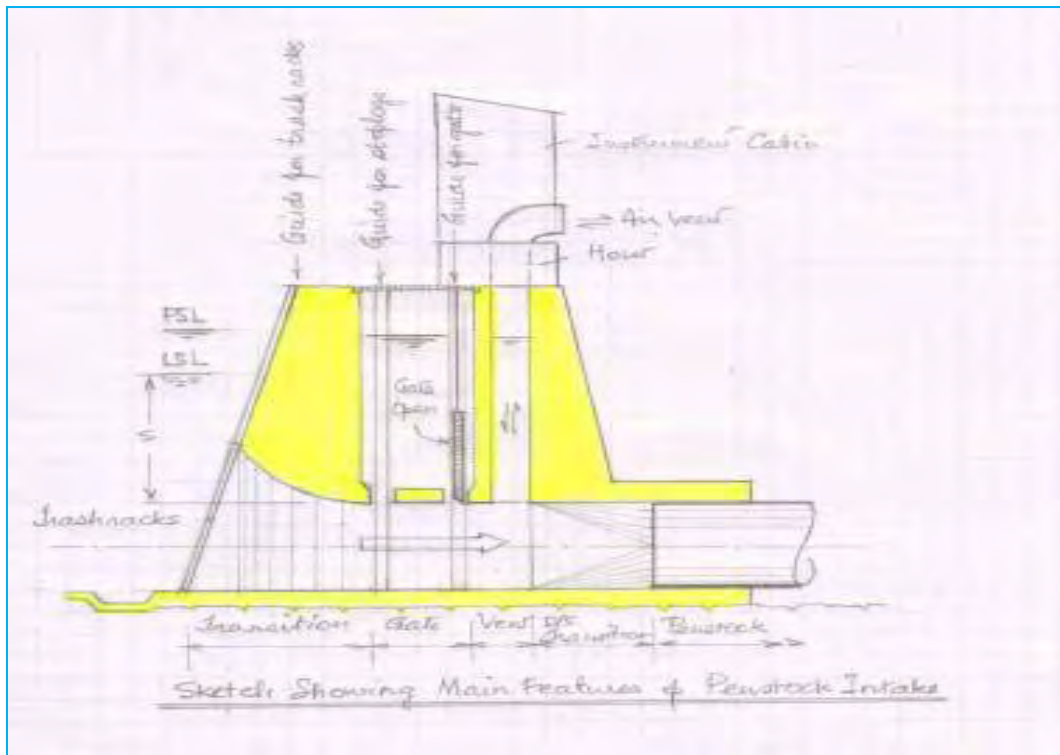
Elevation of Trashrack, penstock intake, and gate structure (AHEC/MNRE/SHP, 2011)
